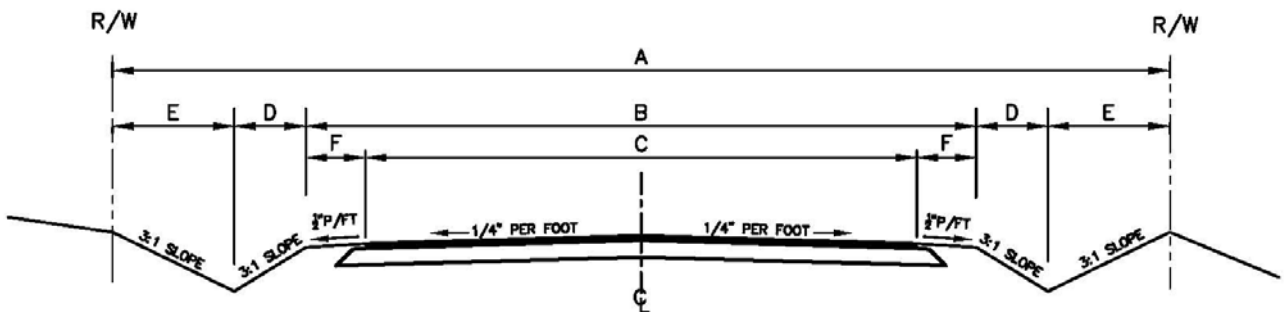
Connection to Existing Roadway-Typical Road Connection
